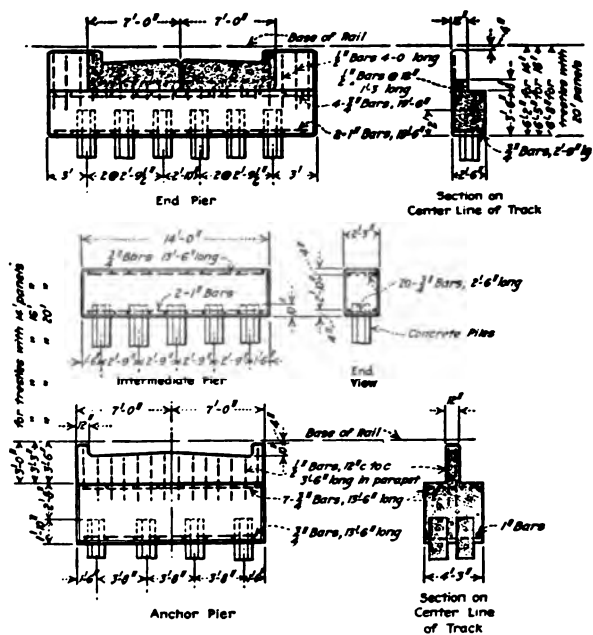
Details of substructure, standard concrete pile trestle, Illinois Central R. R.
